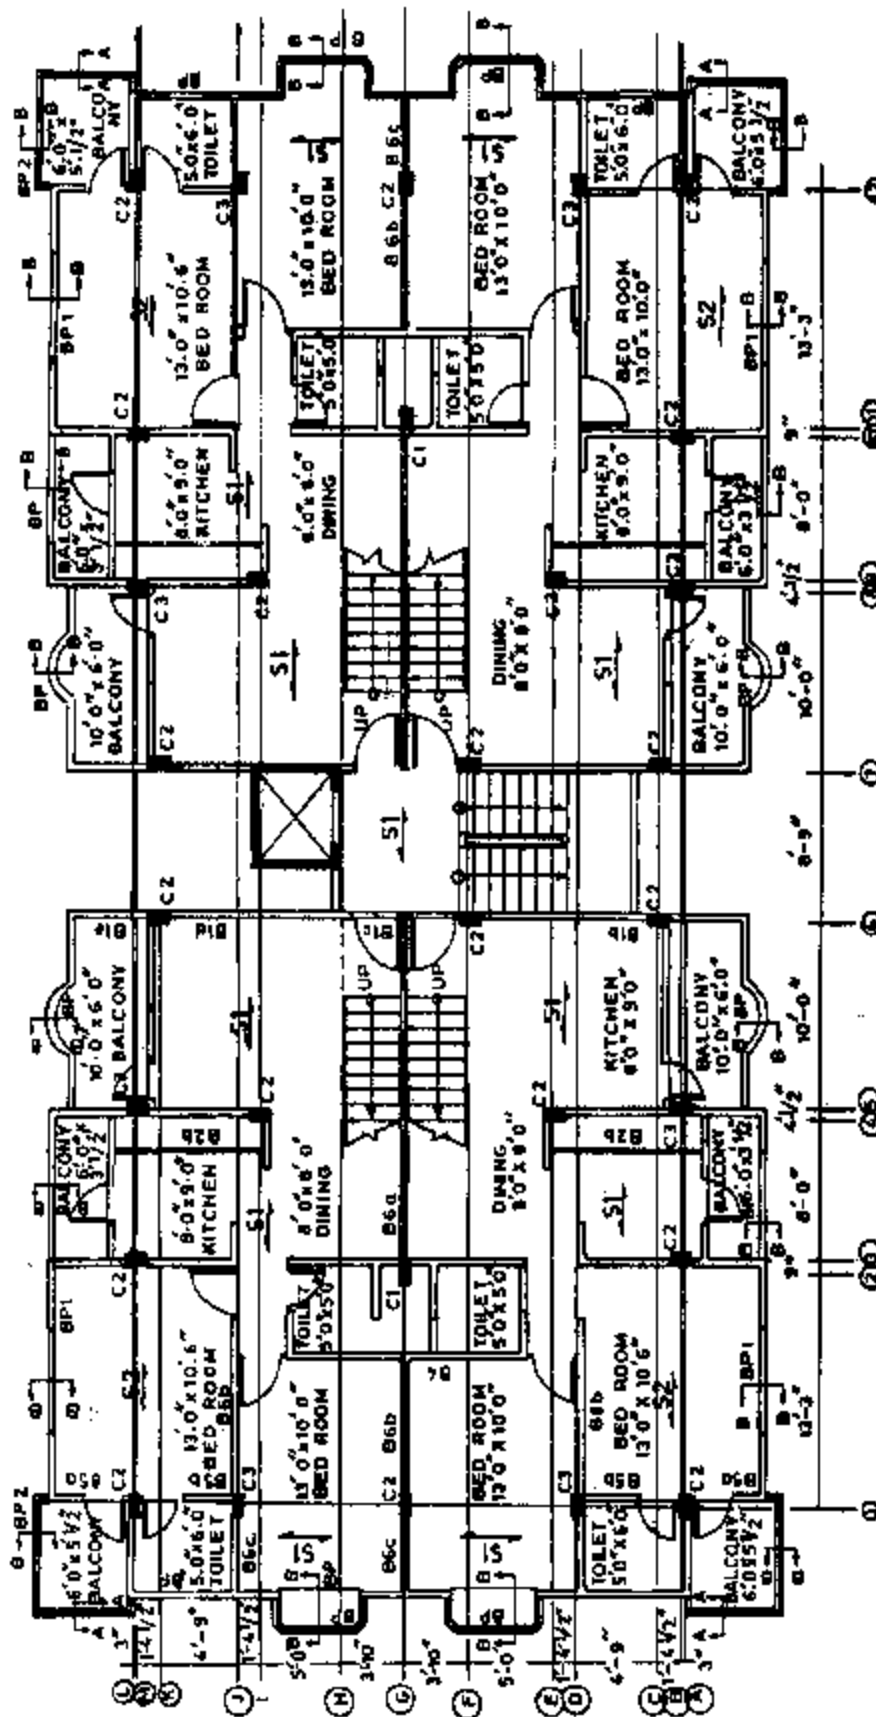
(a) Typical floor plan of a residential building (G+4) in Ahmedabad
